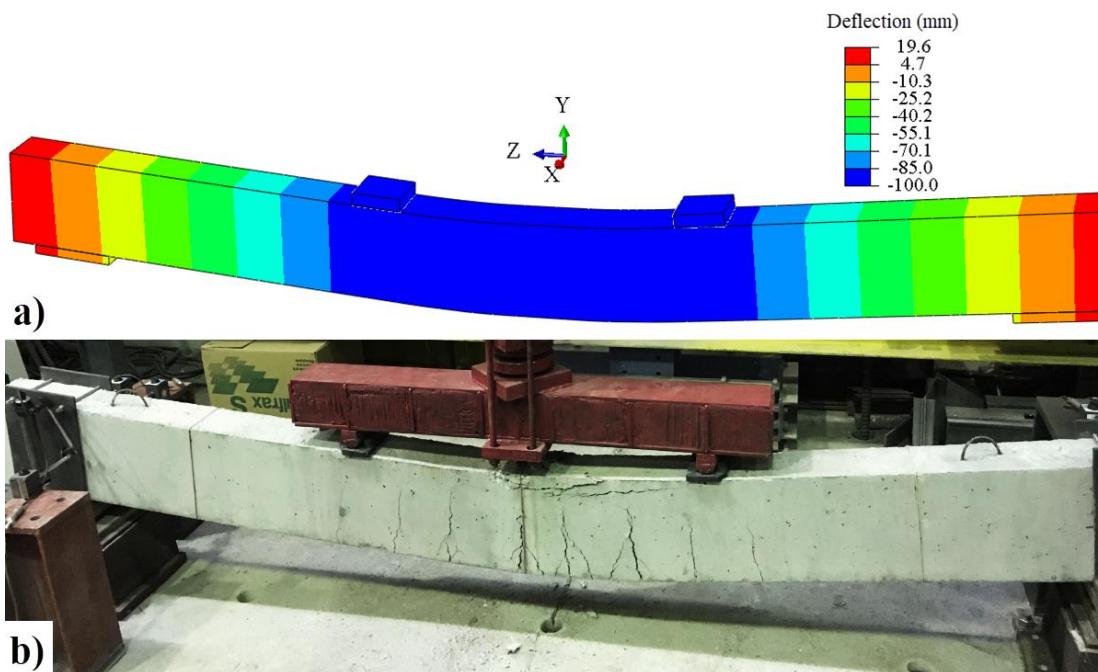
(a) Numerical (b) and experimental deformed shape for the unstrengthened RC beam (specimen RC_AT) at the failure instant: view 2
